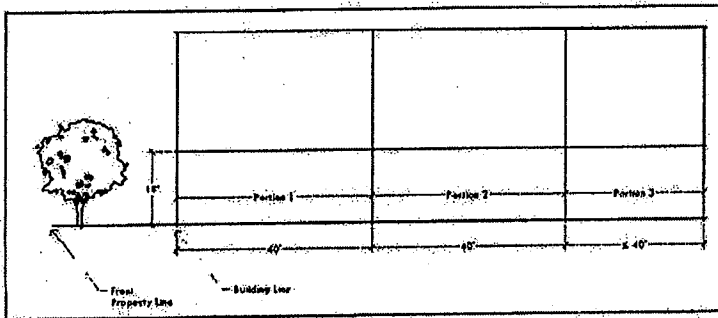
(Elevation View) Dividing Lot into 40-foot Portions to Create Side Setback Planes (Rear Setback Plane Not Shown)
